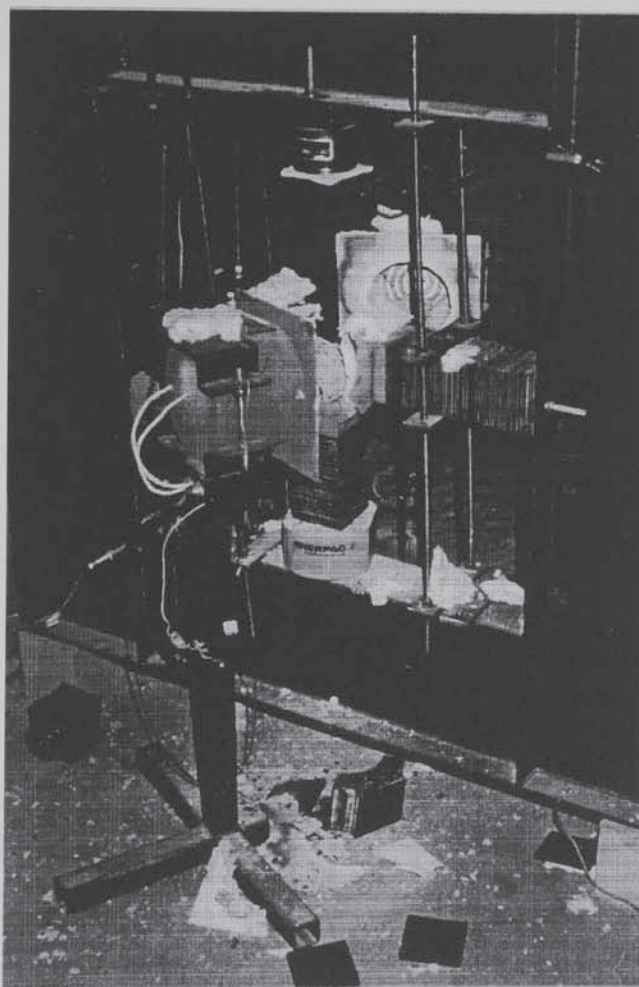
Violent explosive spalling damaging test rig
